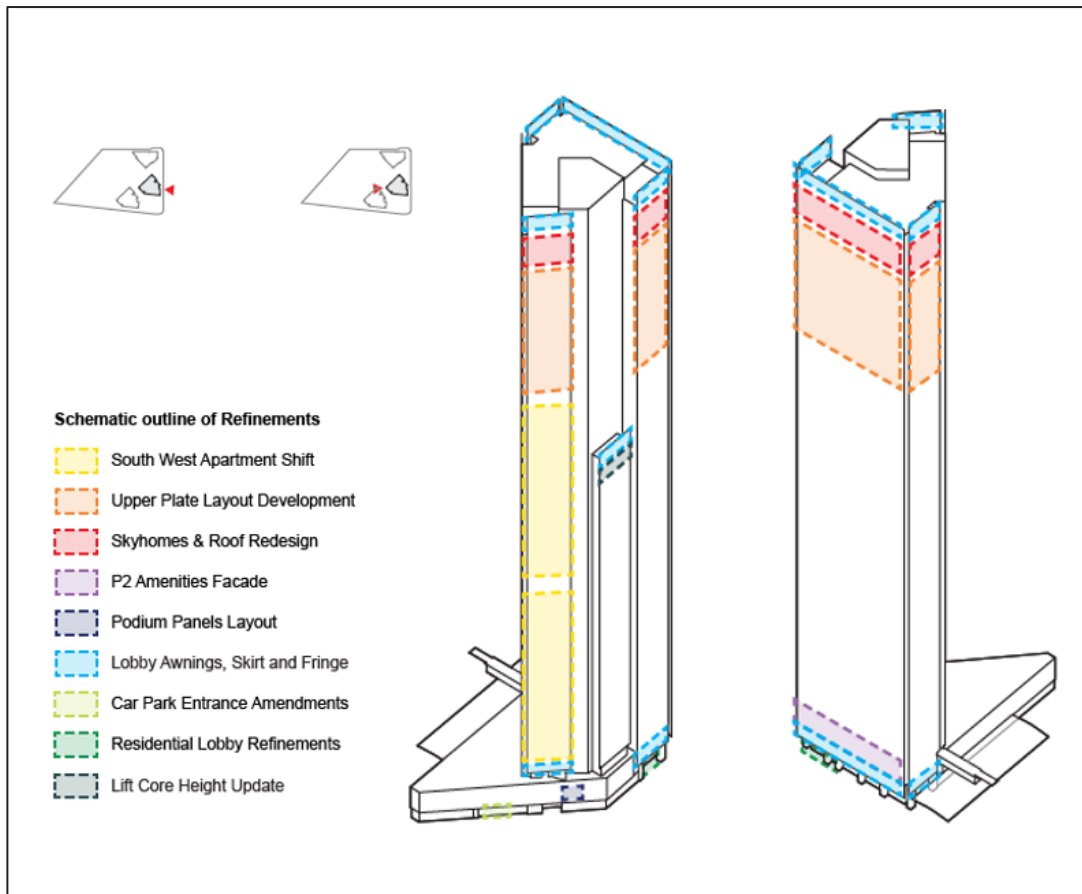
| Location of proposed external amendments to the building (Base source: Applicant's Design Report)
